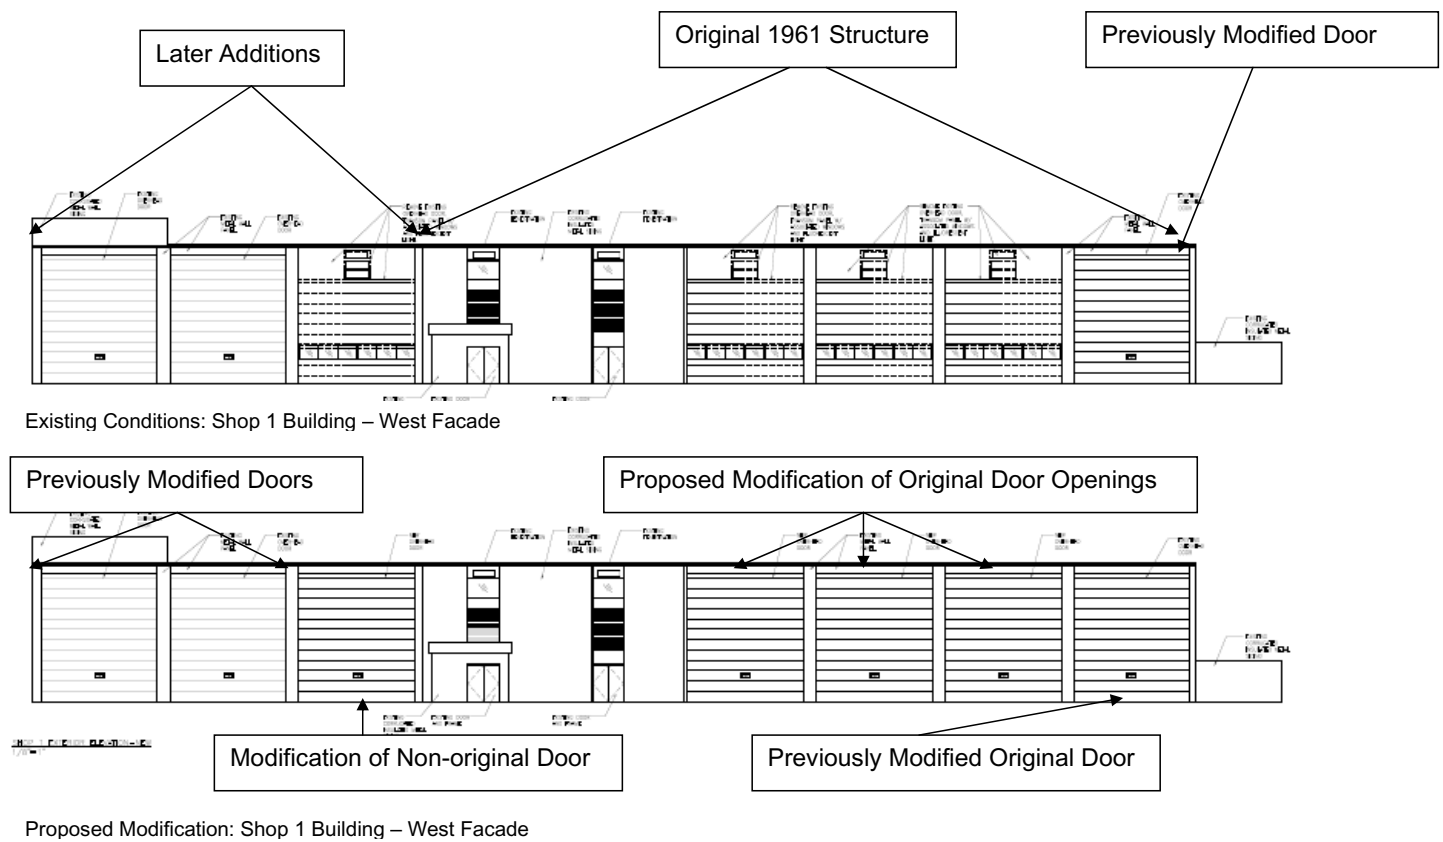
Proposed Modifications to Shop 1 Doors - West Facade
